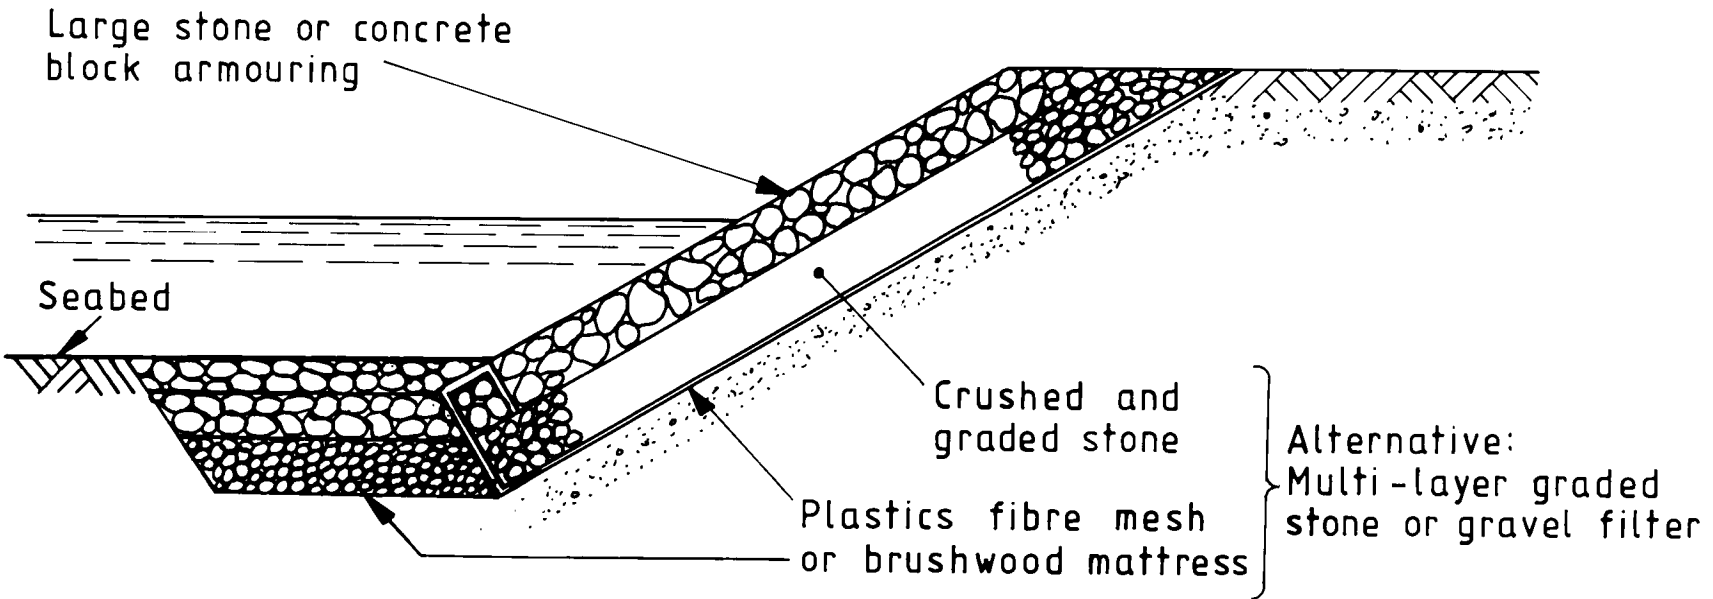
Slope protection by rock or concrete armouring backed by filter layer
